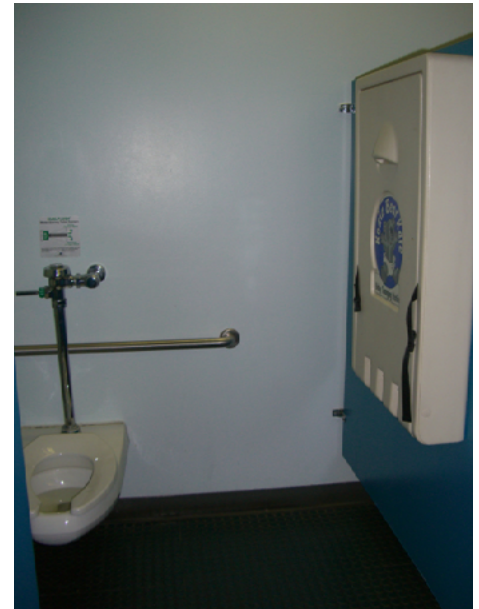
Baby-changing station located inside universal design stall in women's restroom.
